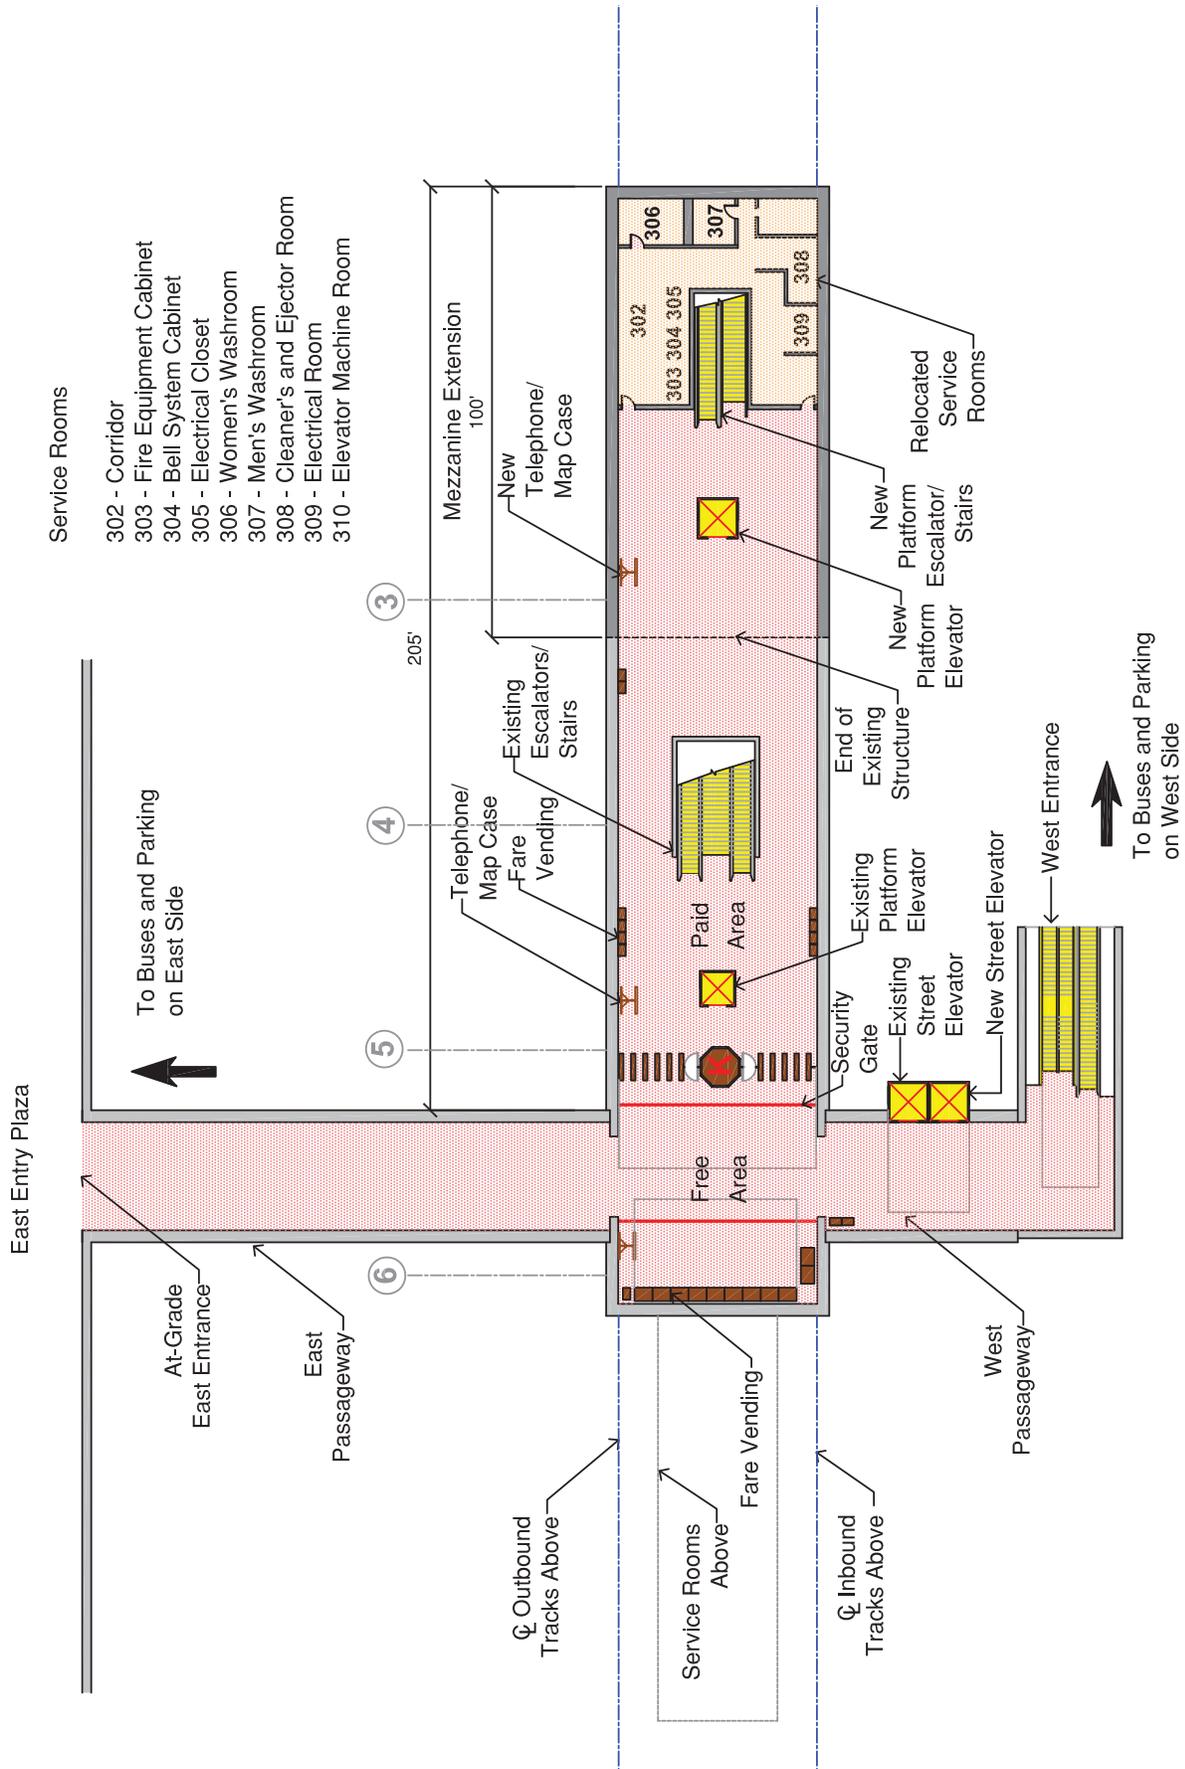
Alternative 1 A - Additional Vertical Circulation (NTS) Mezzanine Plan
